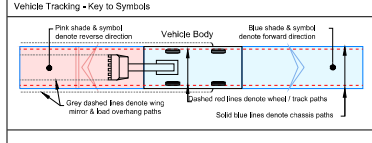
MMD-01-XX-DR-C-DRAFT
